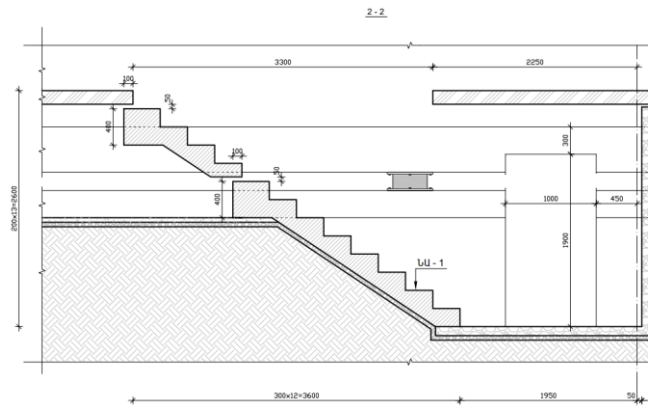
Vertical elevation 2-2 in longitudinal direction of the stairs leading to the building's basement.
